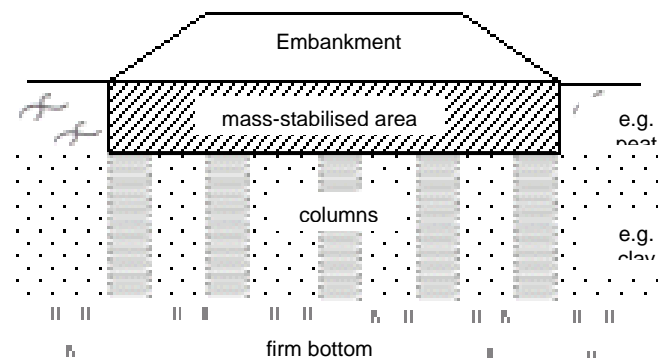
The schema of a structure combining mass and column stabilisation.
